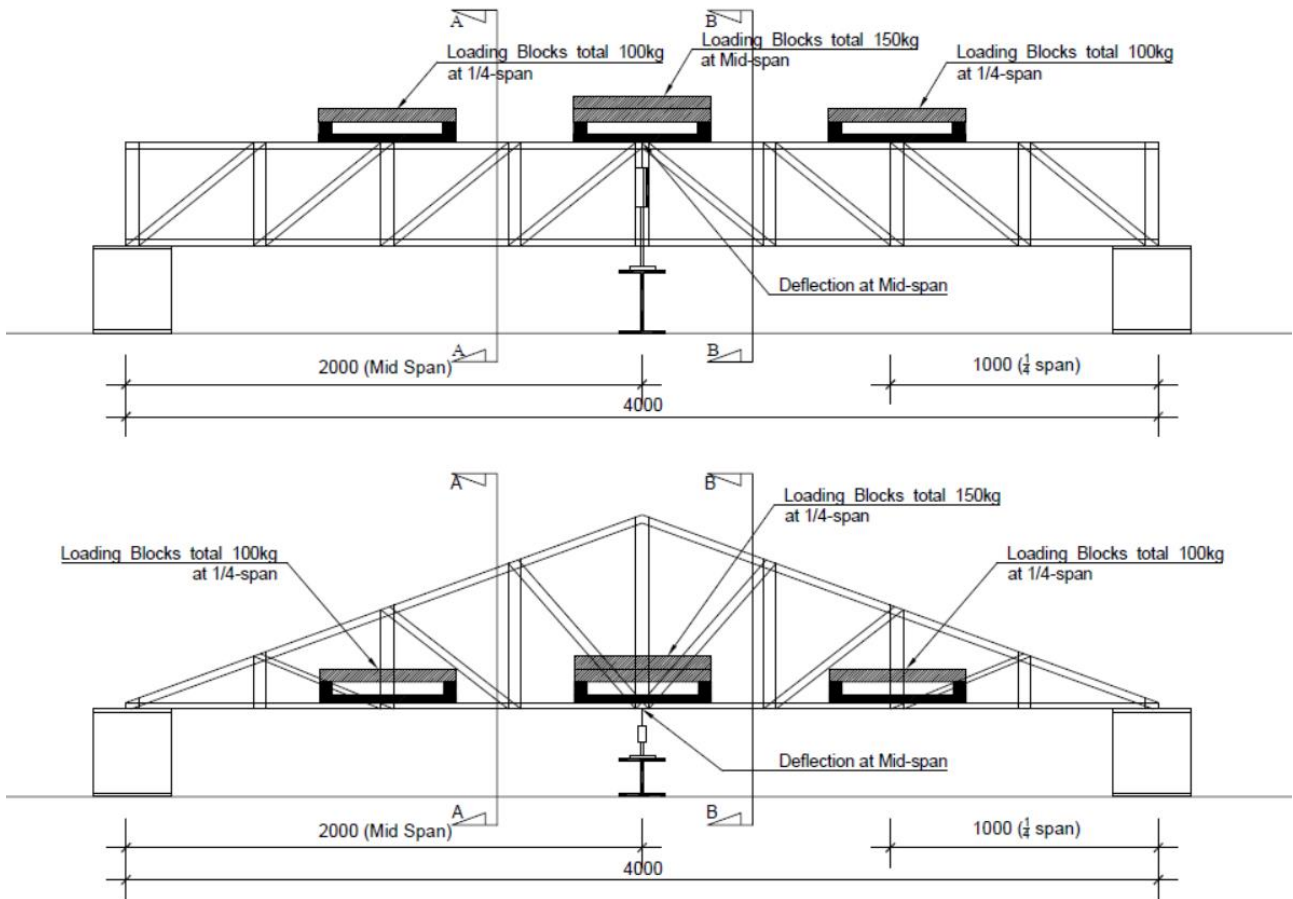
Bridge dimension (Side view) (unit=mm)
